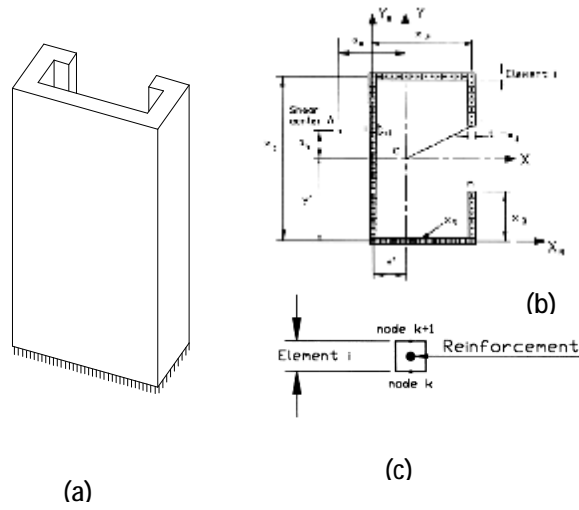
a) C-High rise building. b) Cross-section with principle axes. c) Small element of shear wall.
